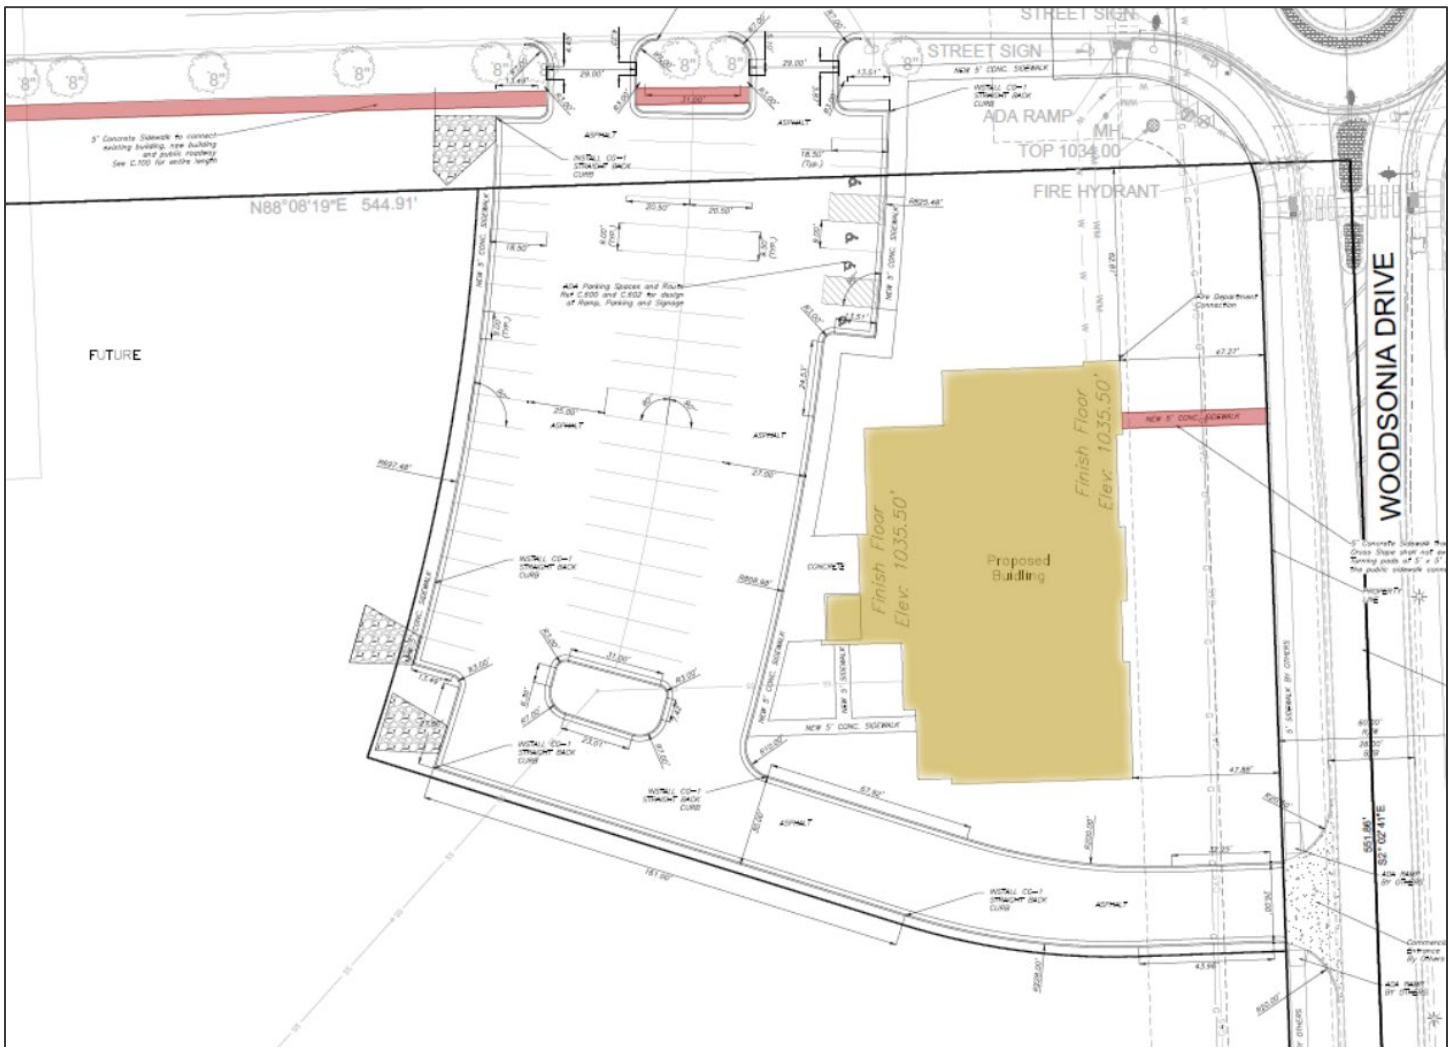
Proposed Site Plan with Future Building and Parking Lot Plans.
